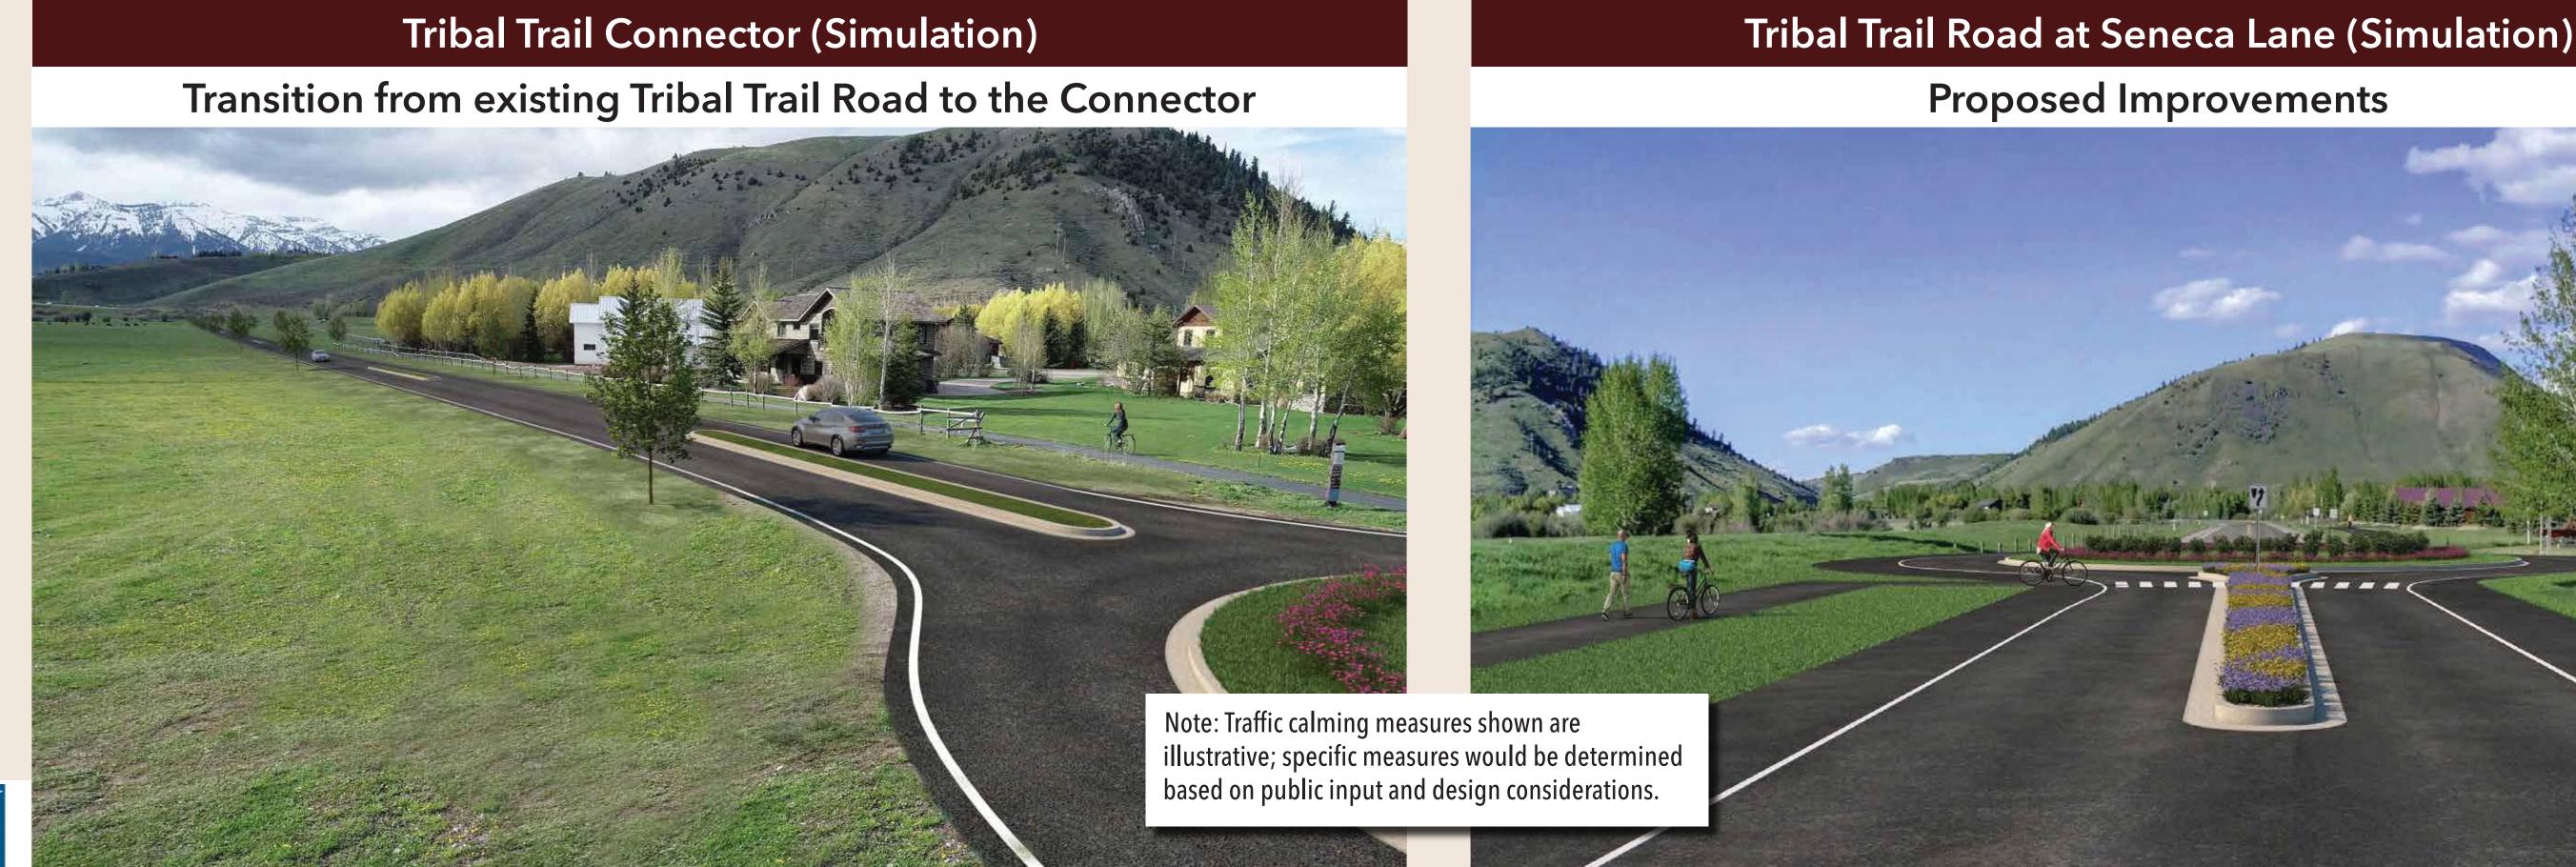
PHOTO SIMULATIONS AND PROPOSED TYPICAL SECTION
